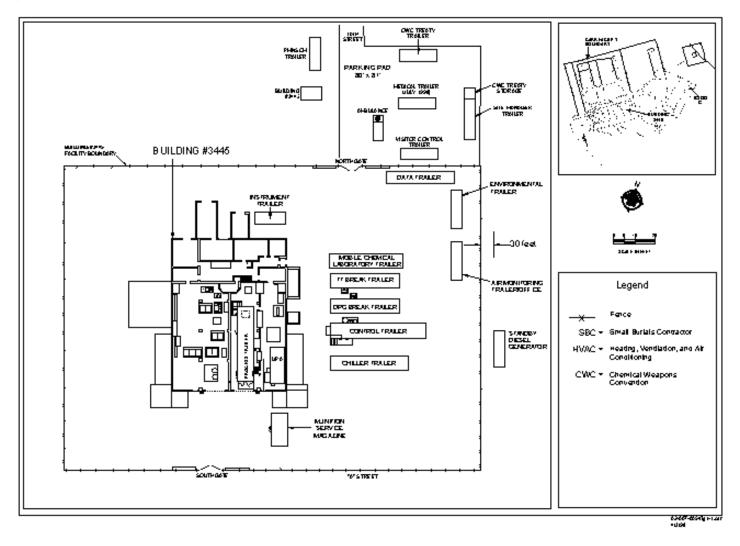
Arrangement of MMD-1 Equipment at Building 3445
